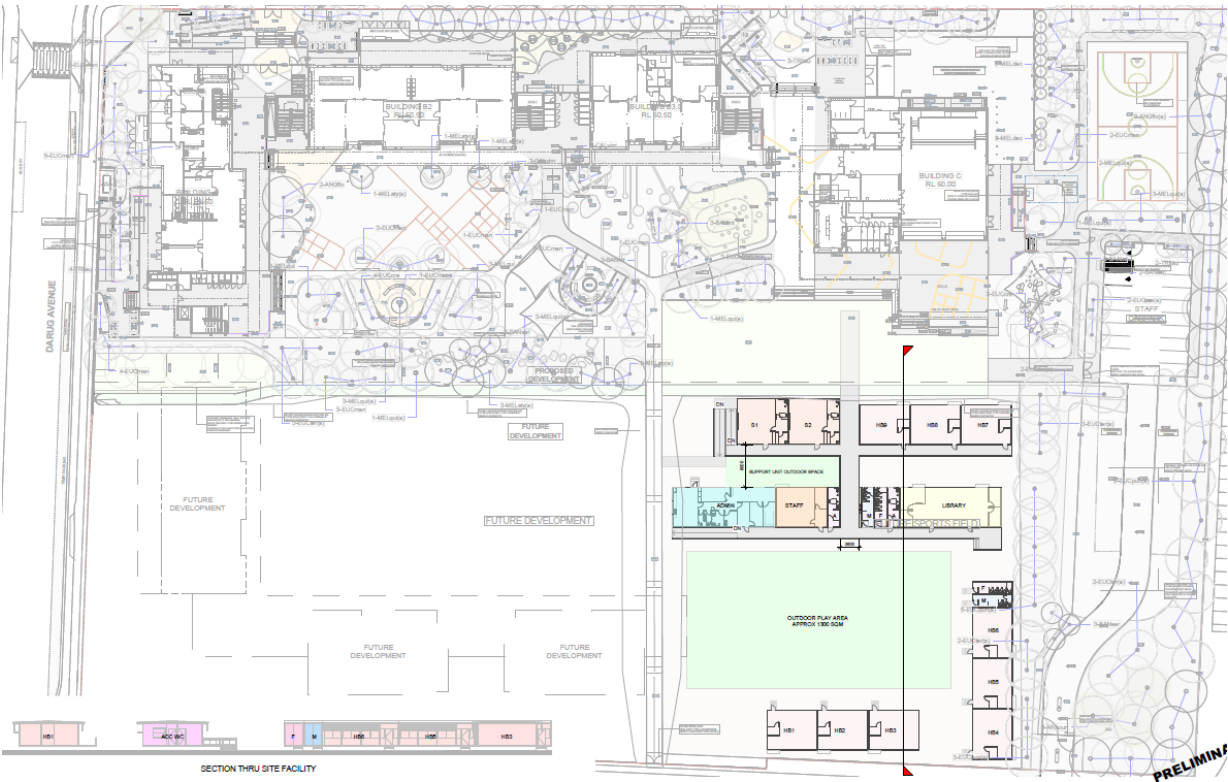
Updated Site Plan – New Public School at Mulgoa Rise
